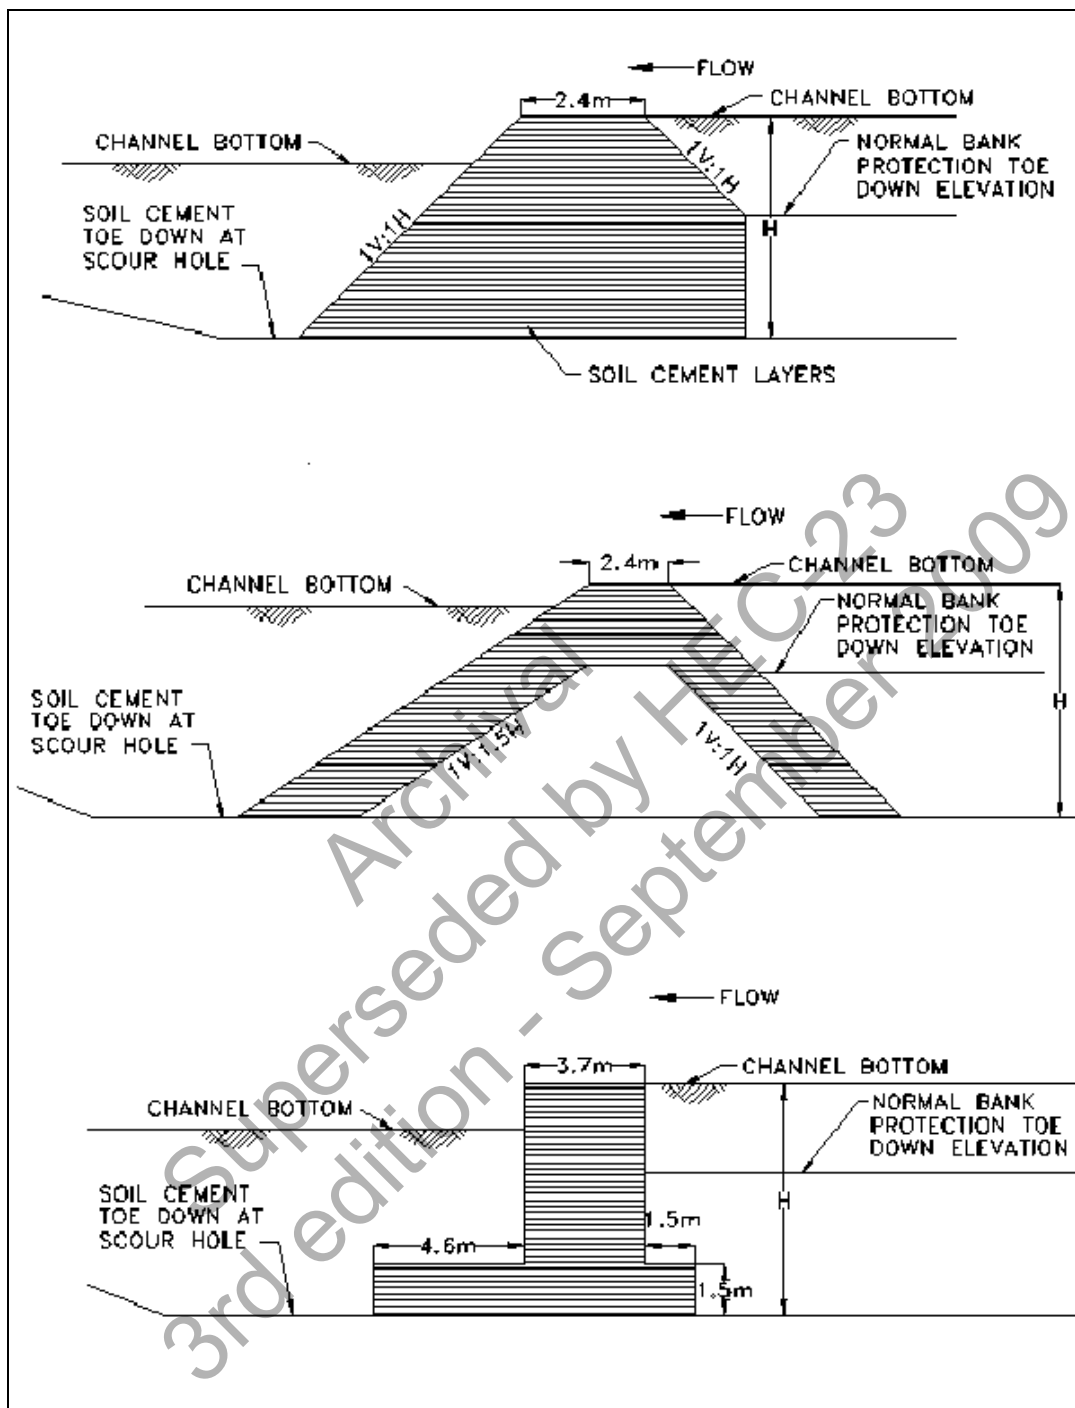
Typical sections for soil cement grade control structures (PCA).
